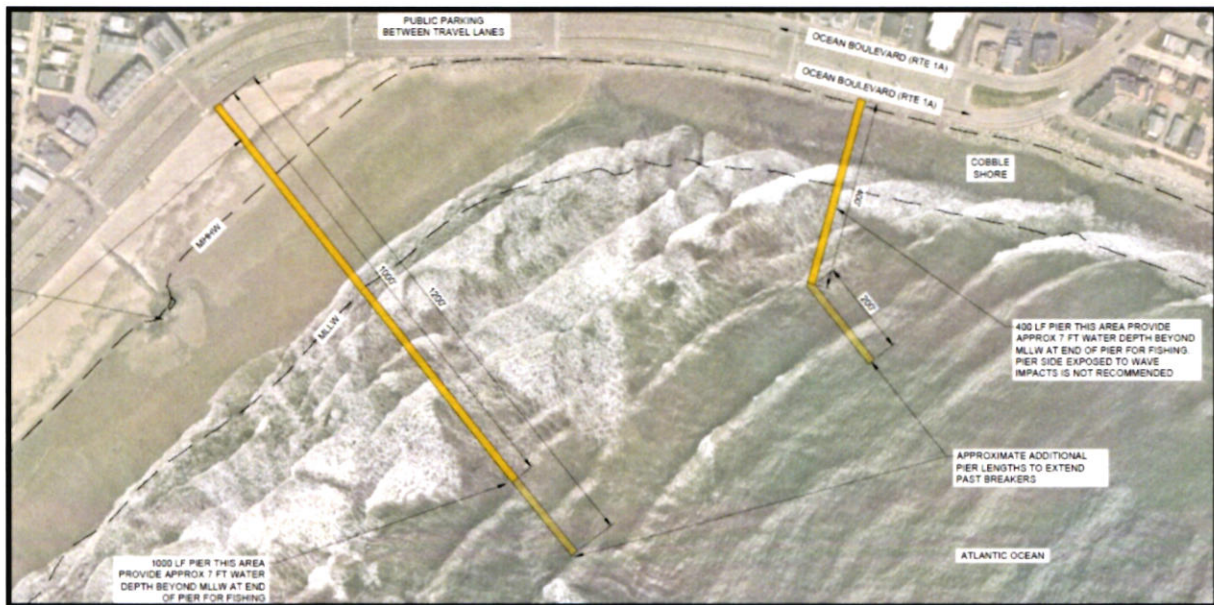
Portion of Area 1 (North End) Proposed Pier Location Options Concept Plan
